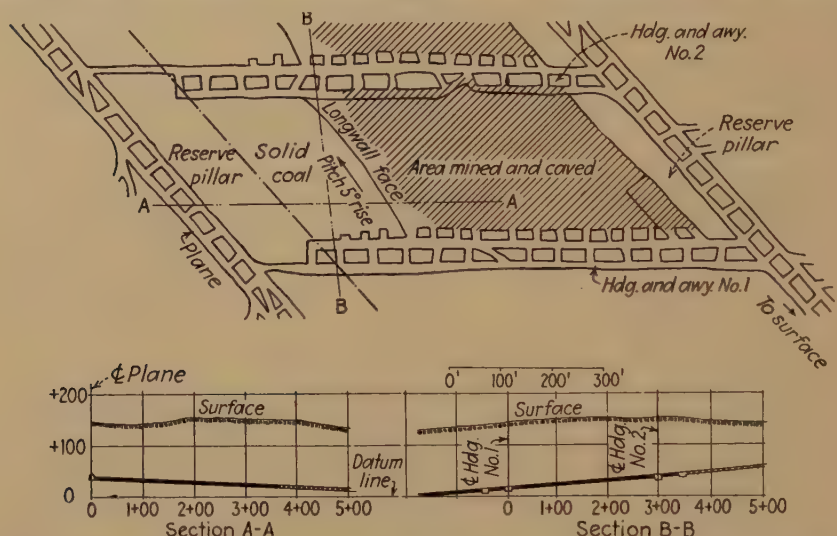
PLAN OF MINE WORKINGS, SHOWING ADVANCING LONGWALL FACE USING SCRAPER LOADER AND COLLAPSIBLE STEEL PROPS.
